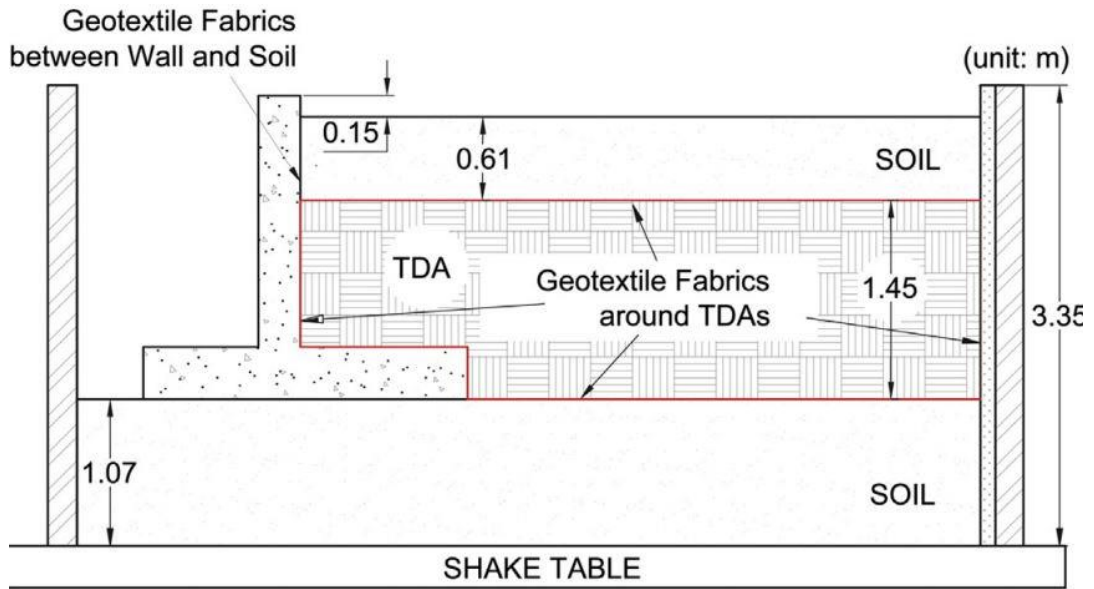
Schematic diagram of full-scale retaining wall (after Ahn and Cheng, 2014)
